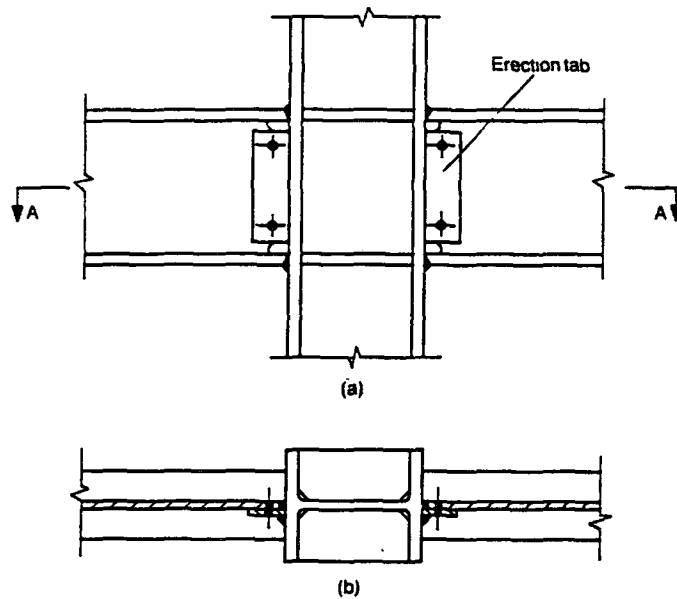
Welded Beam-Column Connection: (a) Elevation; (b) Plan on A-A
